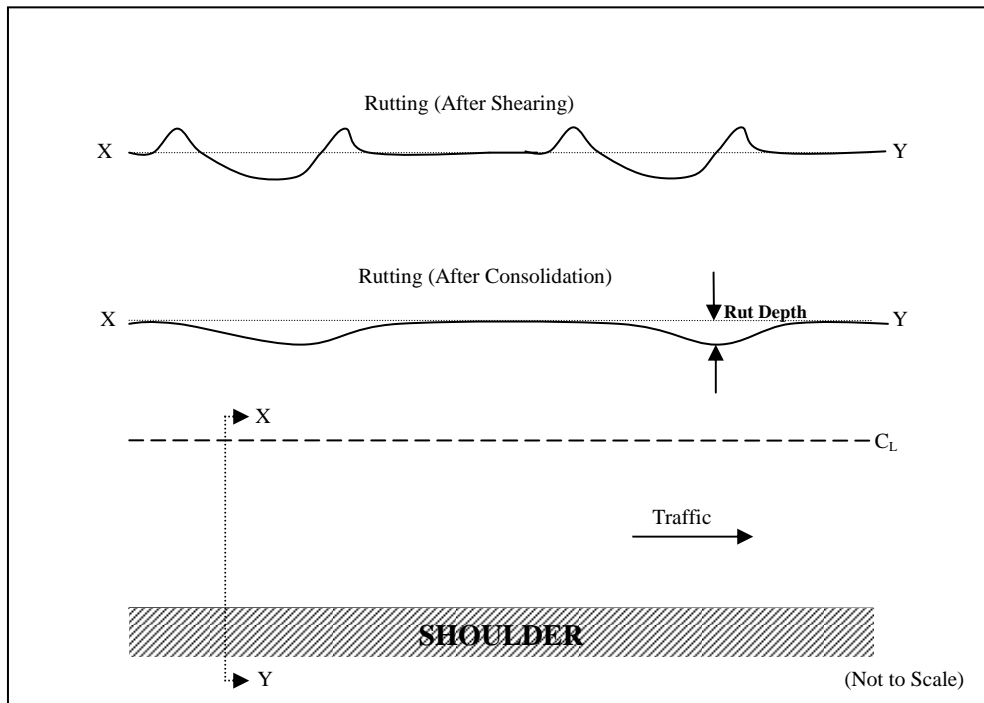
Typical Flexible Pavement Rutting Profile.
